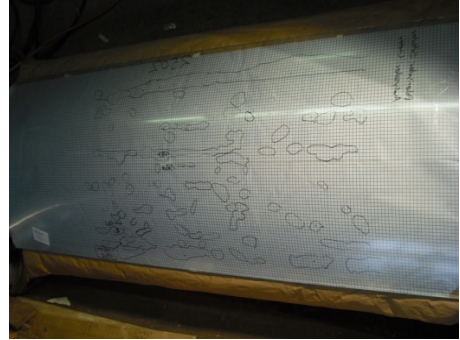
and b: breakage pattern tests a) small specimen with mockup form b) larger specimen with air bag support.
